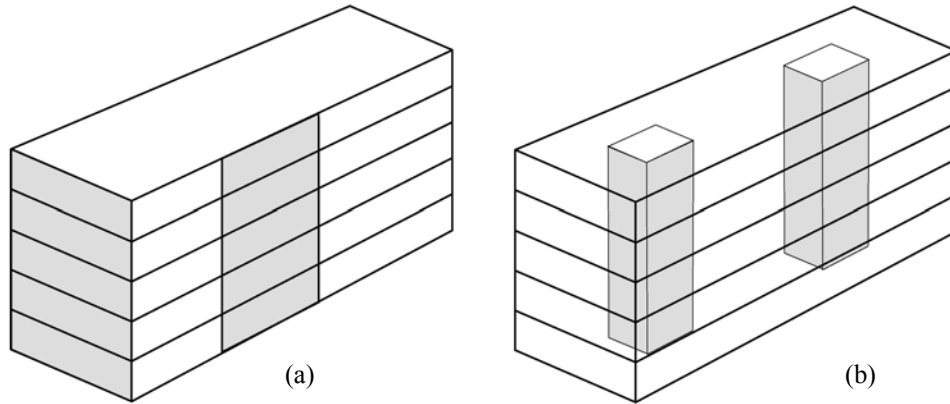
Principles of stabilization by use of (a) shear walls and (b) by shafts.
